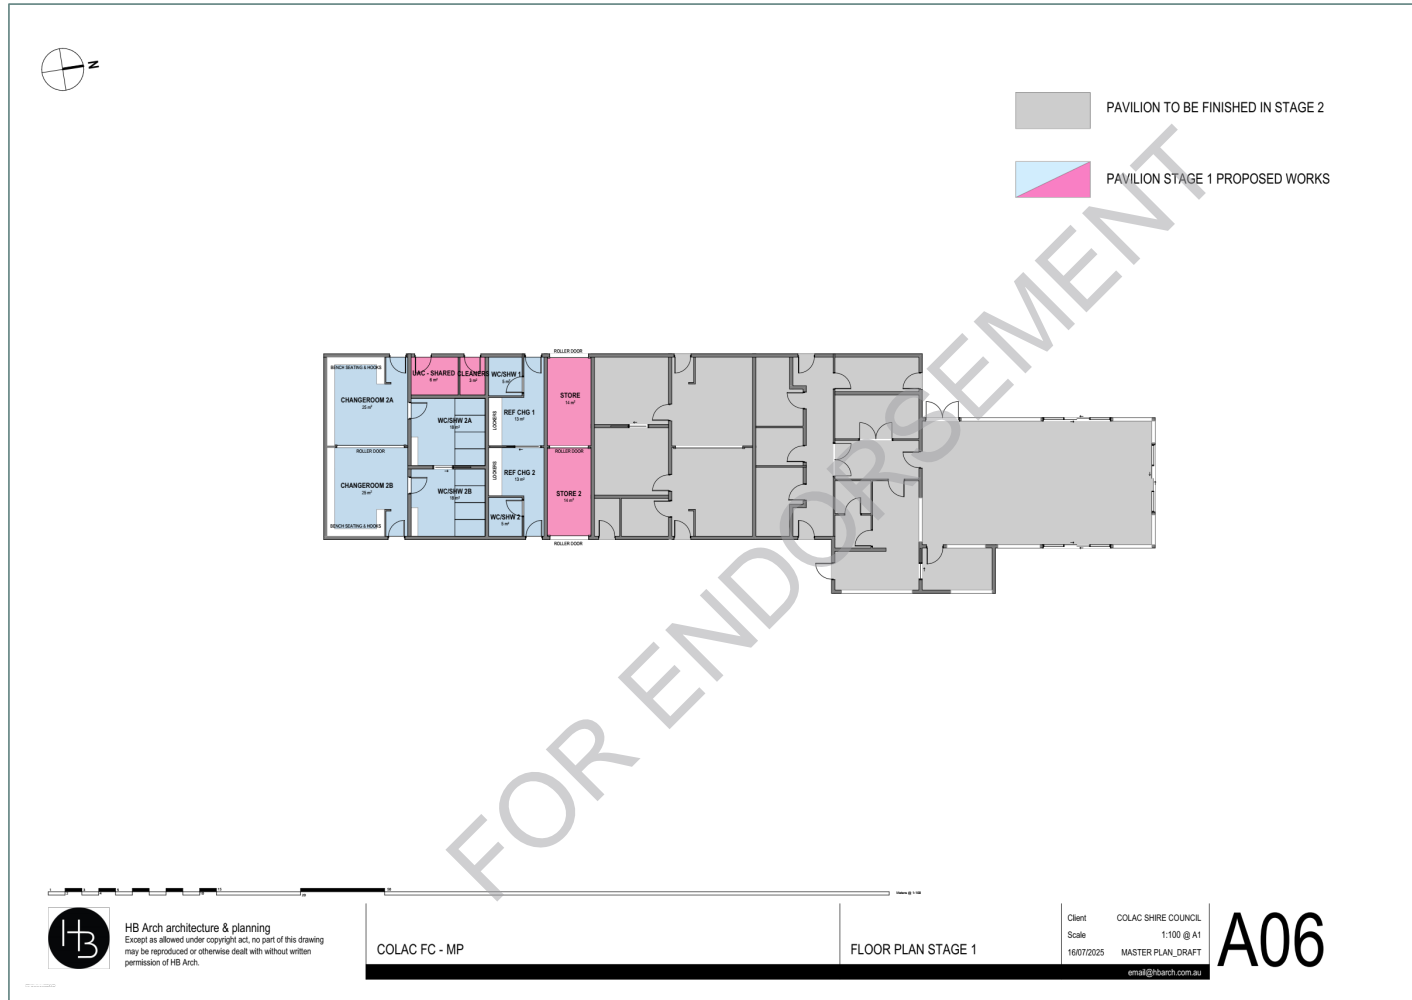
Pavilion Concept Plan – Staging Plan (Half Scheme)
